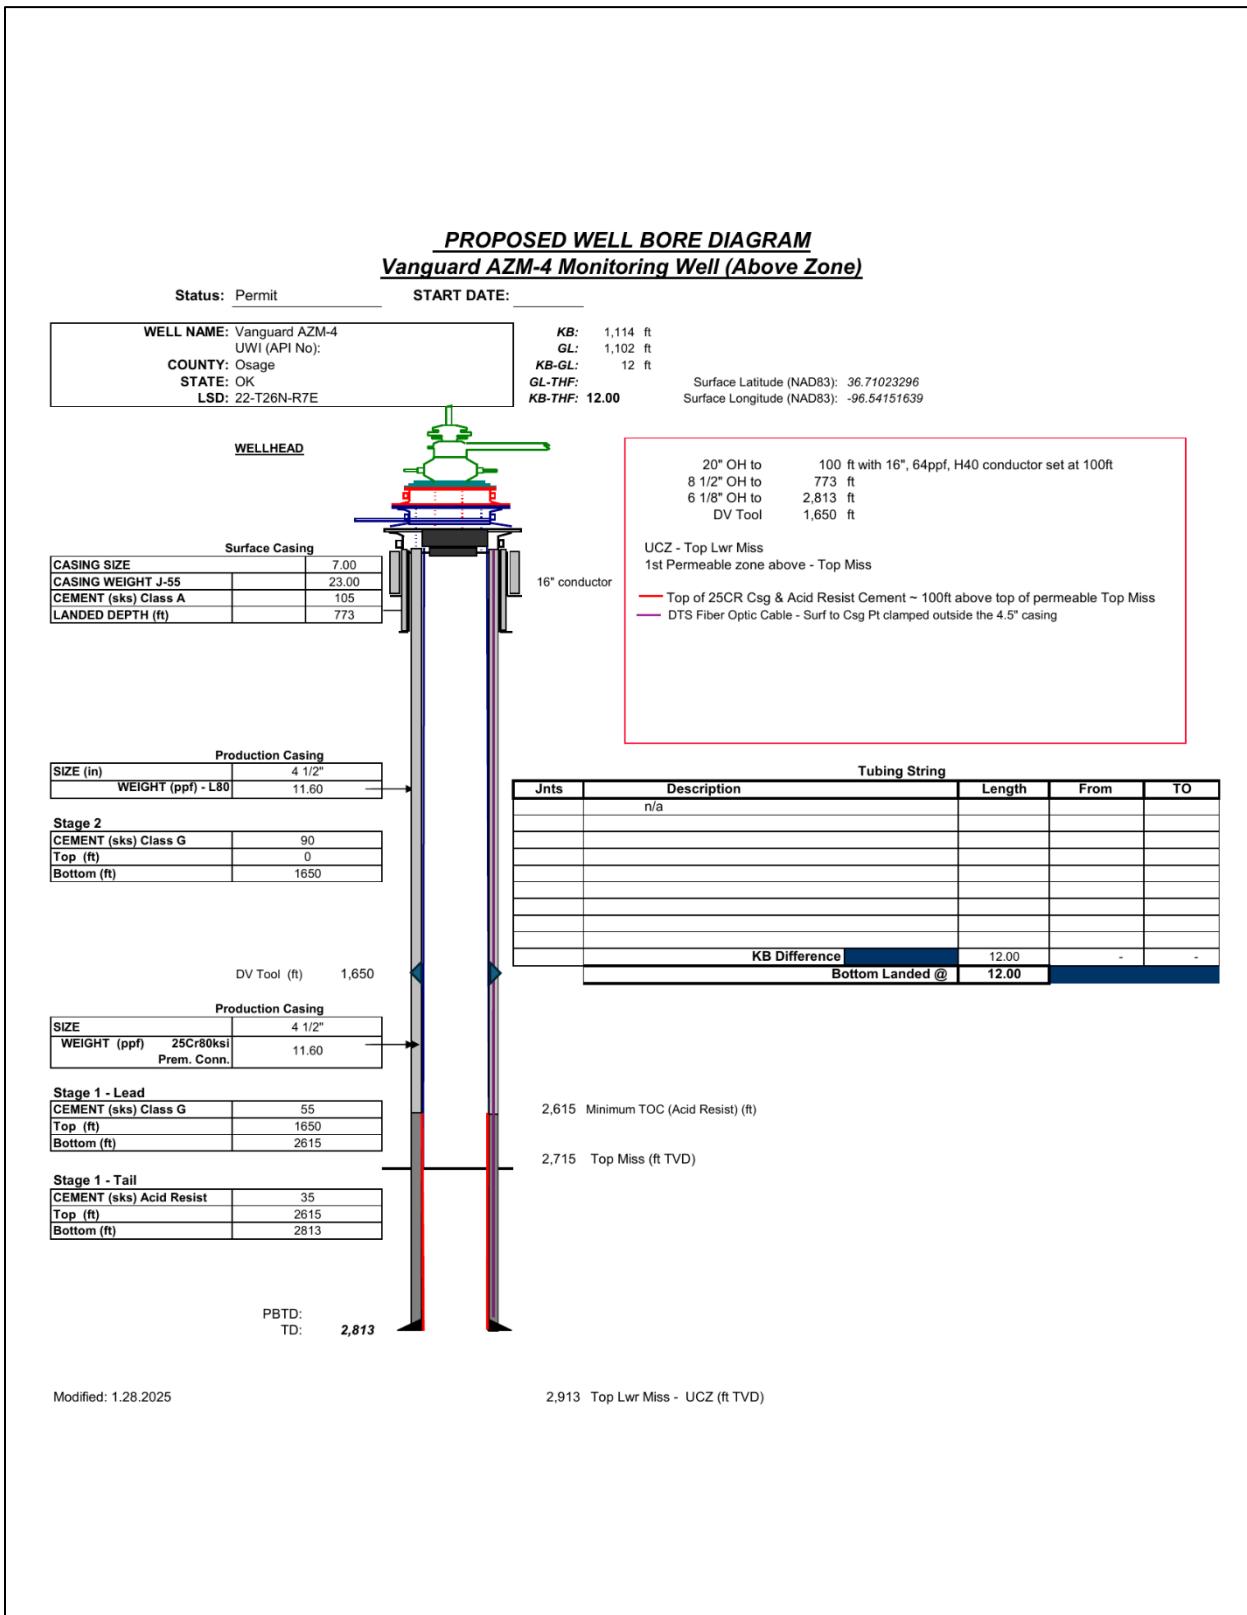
Planned well construction diagram for the Vanguard AZM-4 Monitoring Well (Above-Zone).
